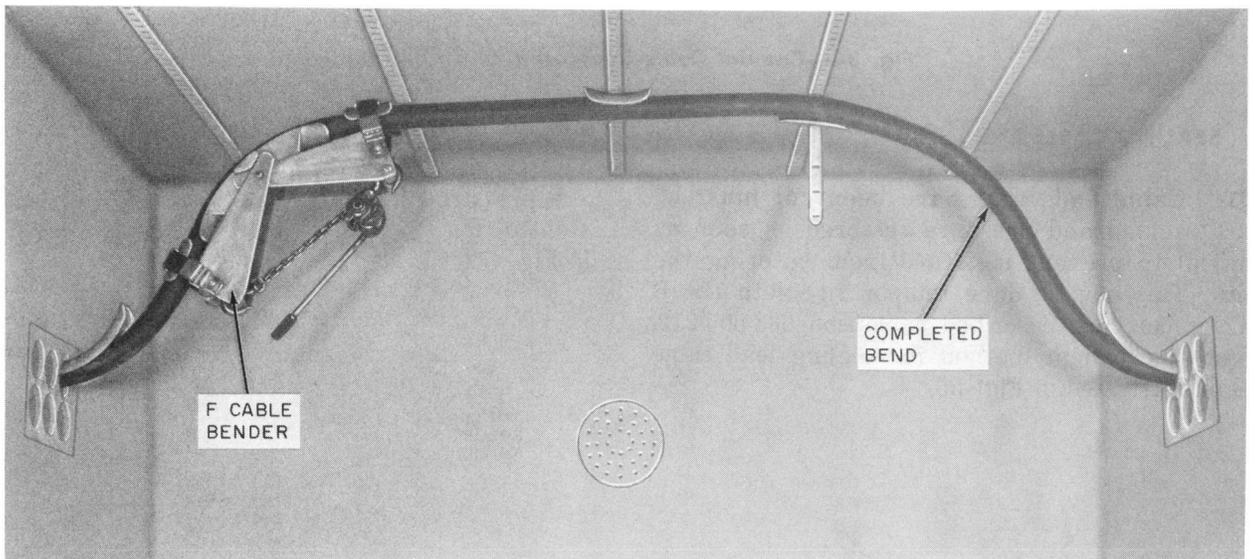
Final Racking Shape Obtained With F Cable Bender
